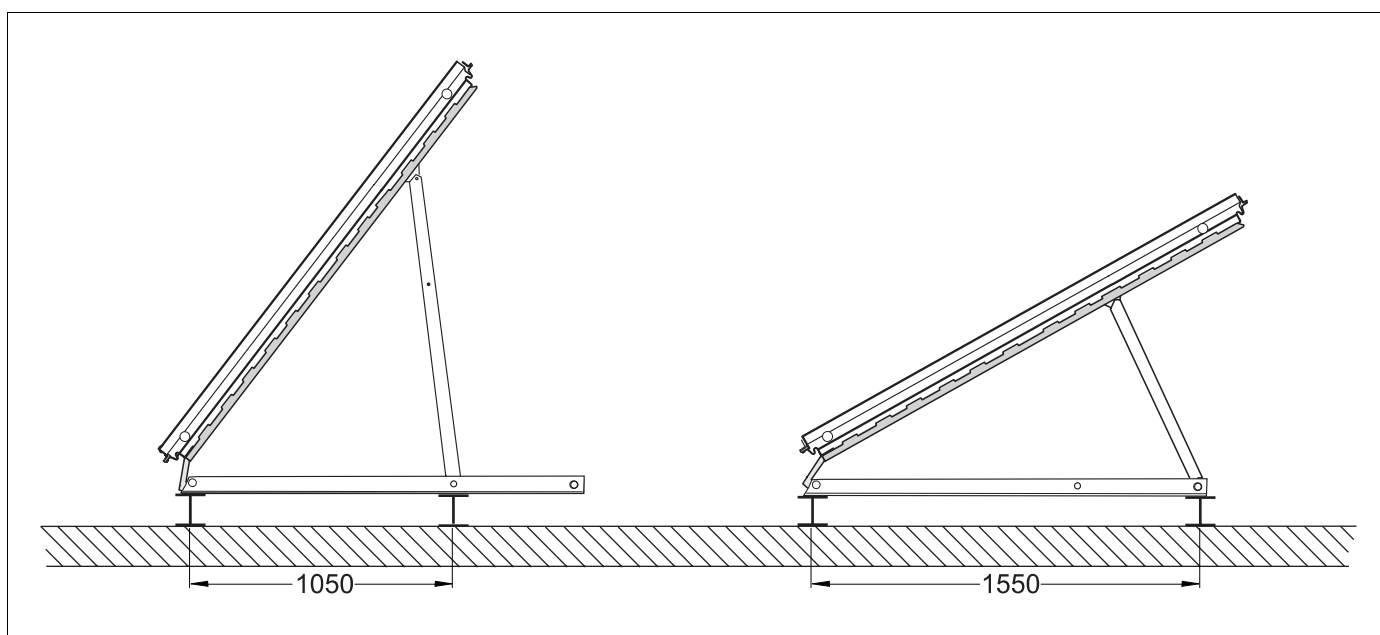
Flat roof stands mounted on girders and also fastened with U-bolts (dimensions in mm)
